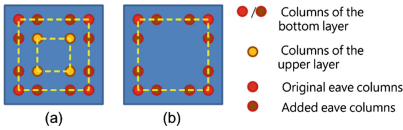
The top-view of the two column layouts: (a) double-rounding column structure, and (b) single-rounding column structure. (Color figure online)
